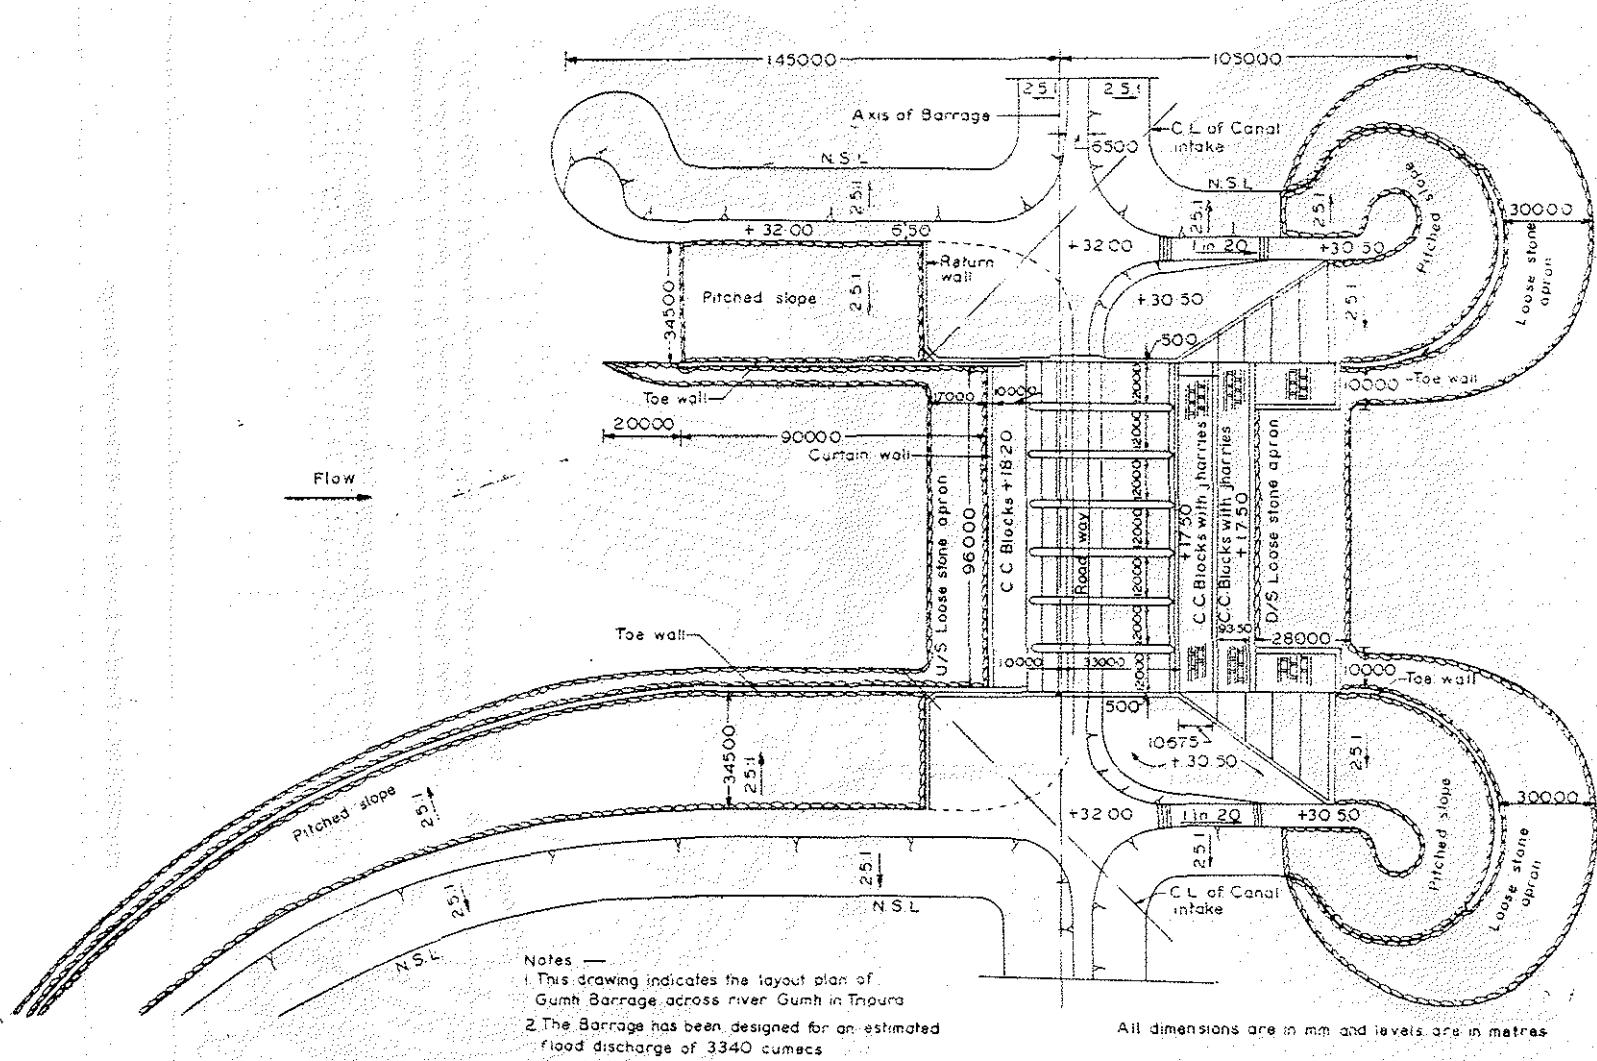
Detailed Layout Plan of Gumti Errage.
